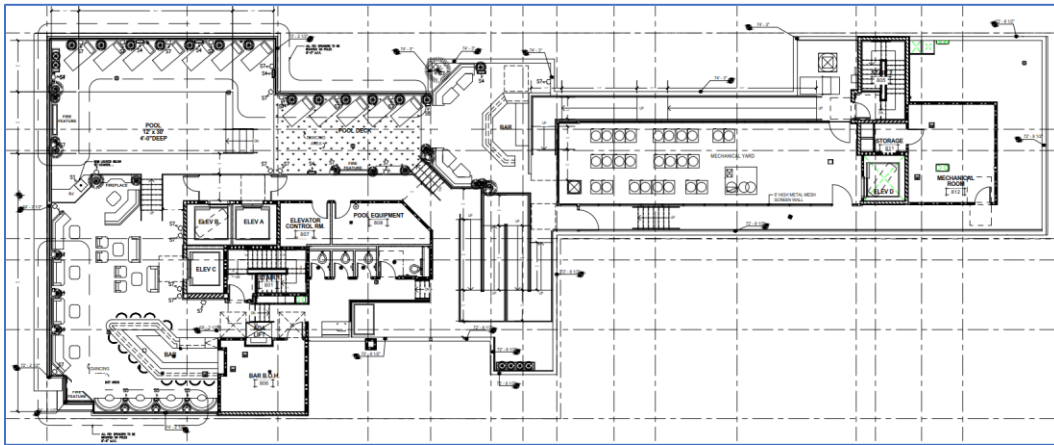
AC HOTEL GASLAMP ROOFTOP RESTAURANT - SITE PLAN
